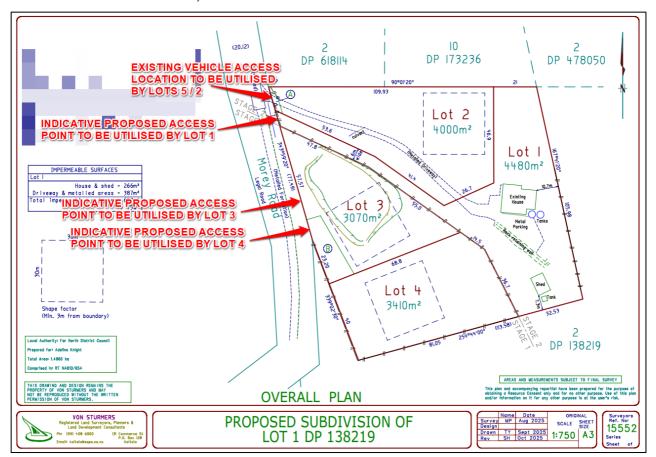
Snip of Scheme Plan Showing Existing & Proposed Access Points.
